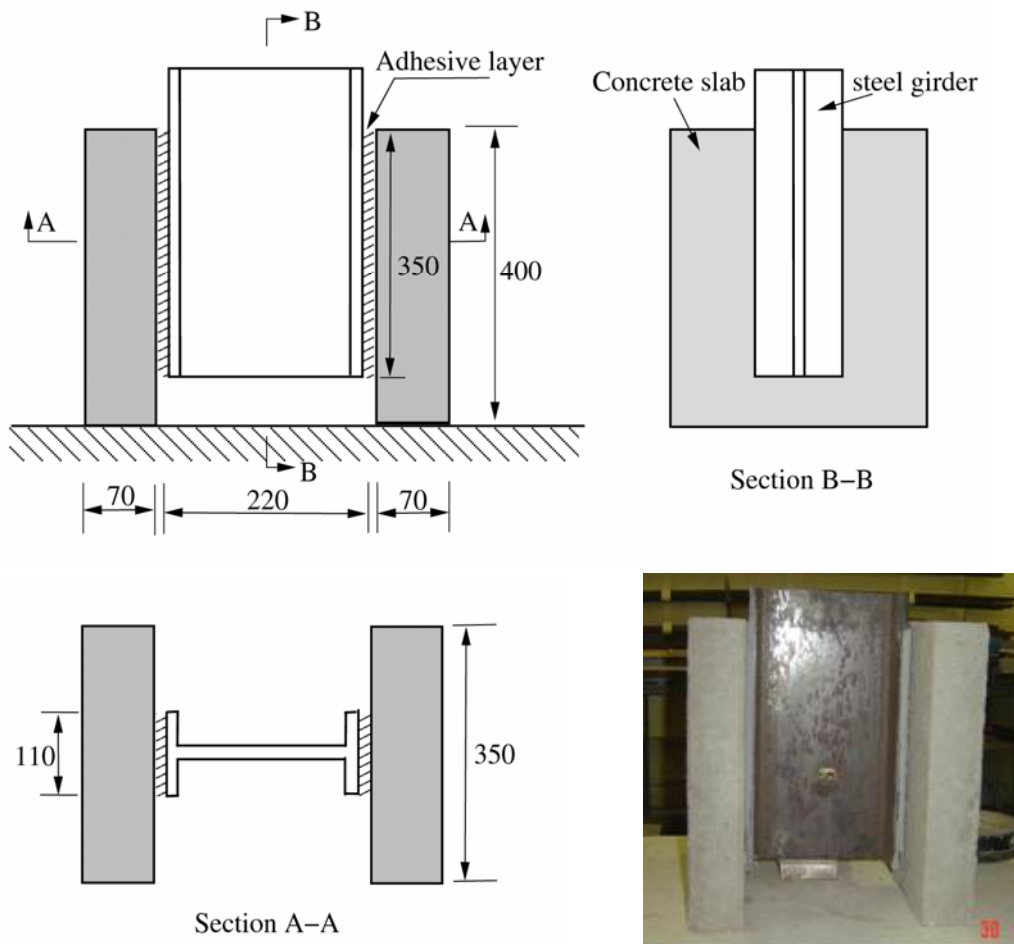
Dimensions of push-out specimen (unit: mm)
